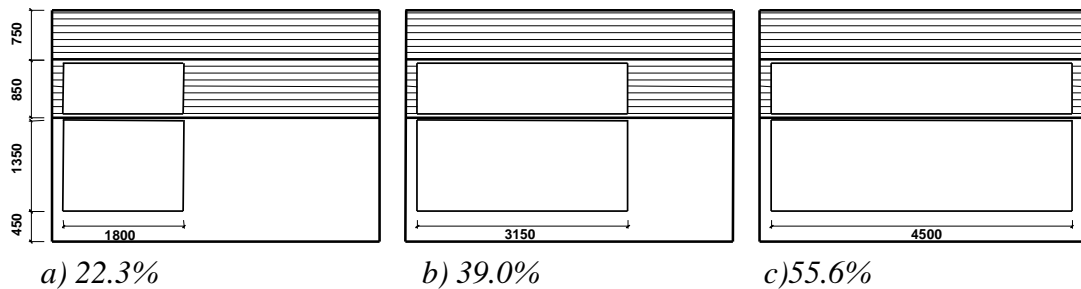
Three elevations of alternative window-to-floor ratio due to change of the window width.
